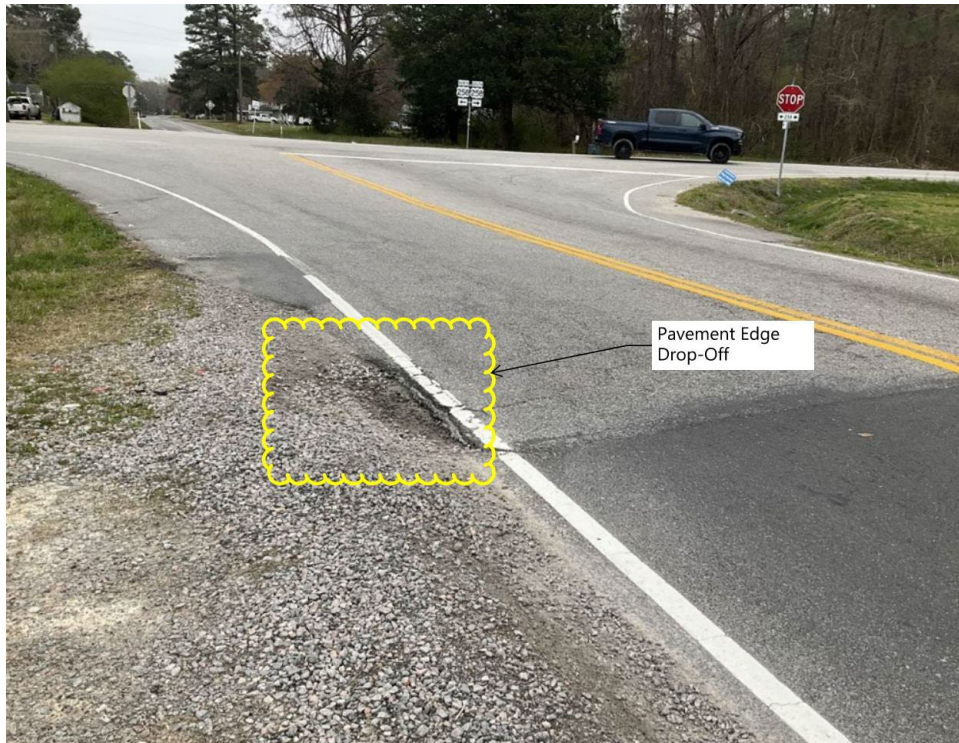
Pavement defects and gravel deposition on Foursquare Road
